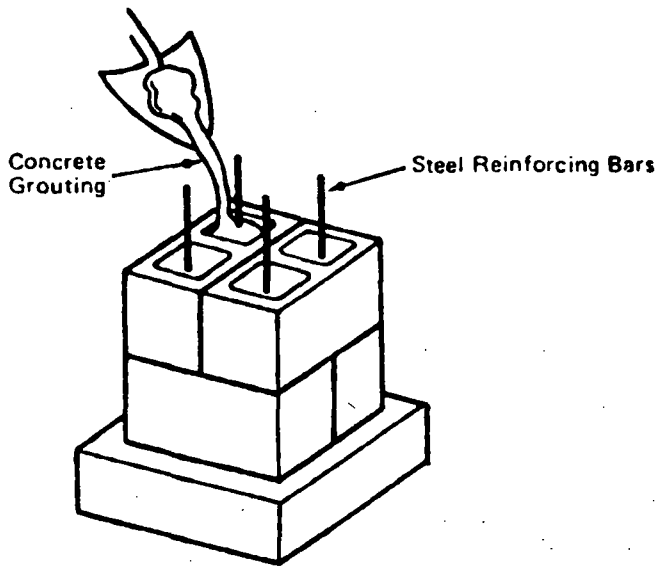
For piers exceeding 80 inches in height the concrete blocks must be filled with concrete grouting and steel reinforcing rods utilized.
